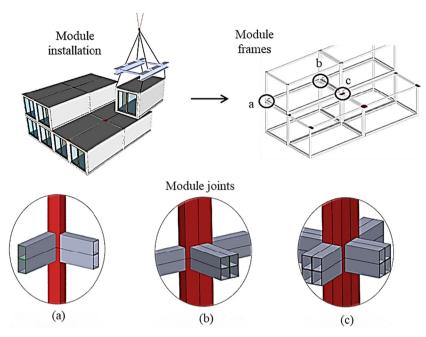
Modules connected at different joints (a) corner joint with 2 columns and 4 beams; (b) external joint with 4 columns and 8 beams; (c) internal joint with 8 columns and 16 beams.
